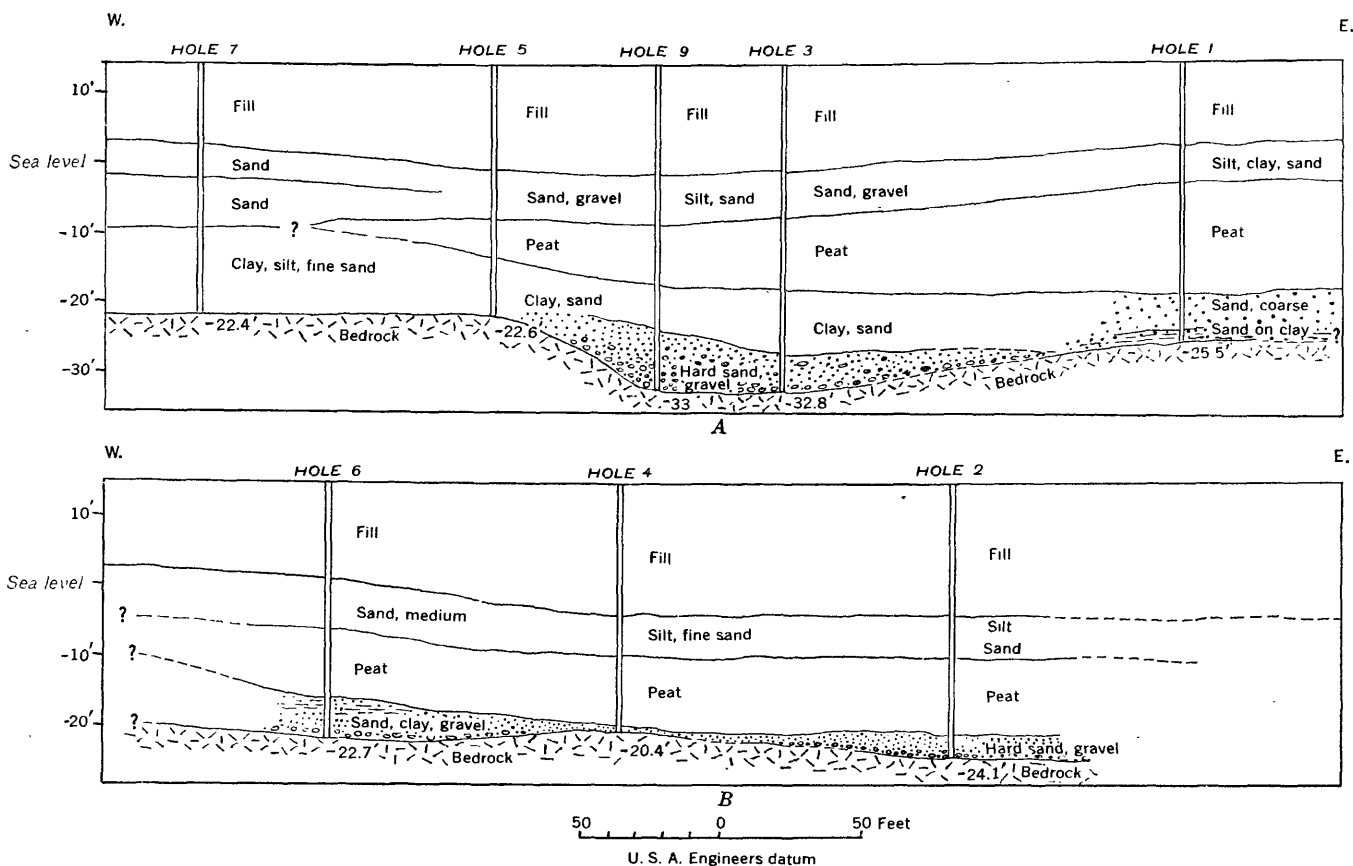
Sections at northeast corner of Navy Department Building. B is about 75 feet south of A.
